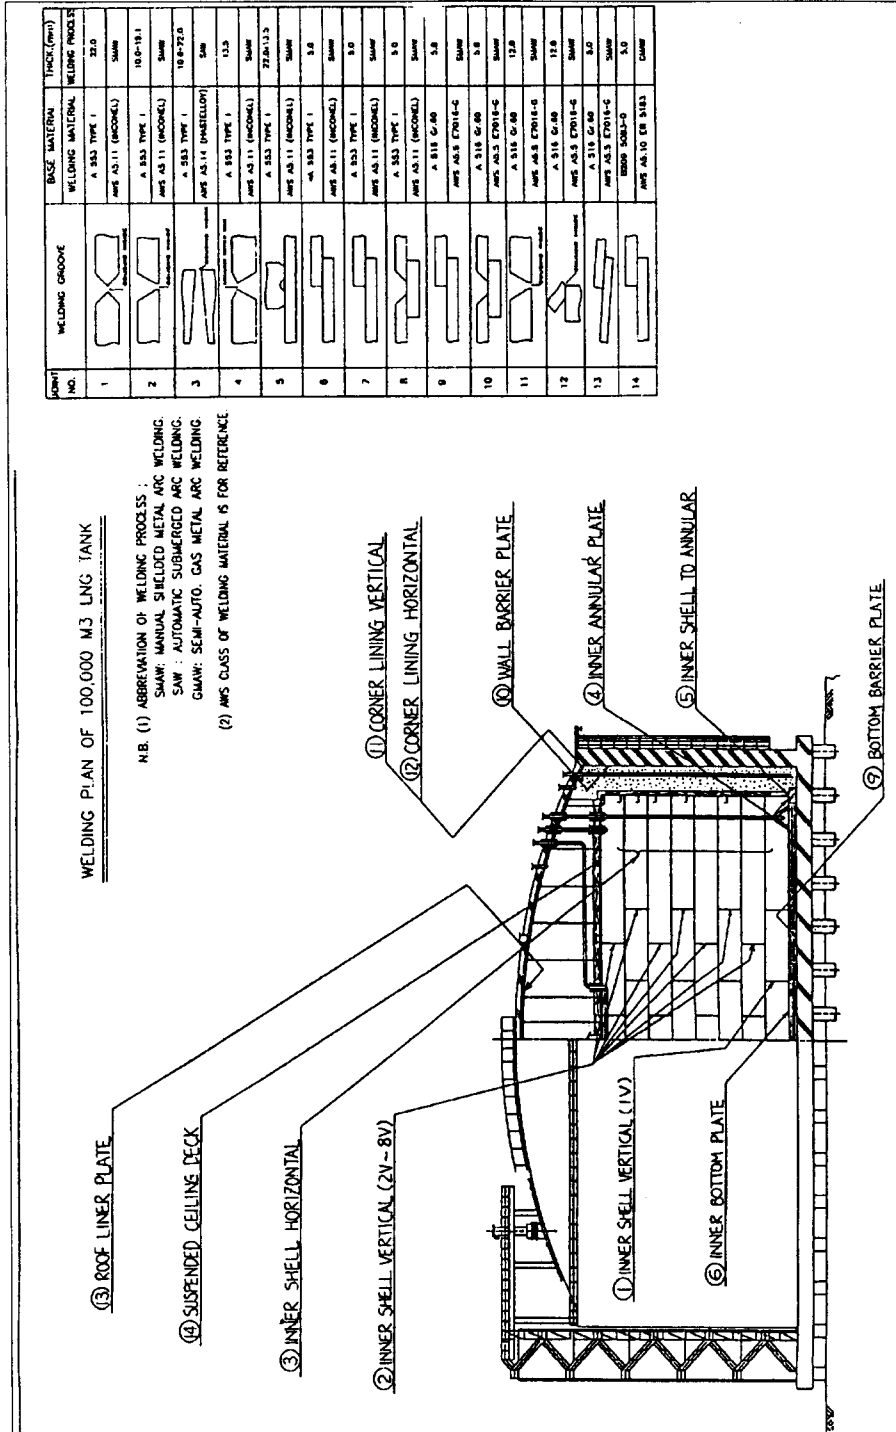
WELDING PLAN OF 100,000m<sup>3</sup> LNG TANK
